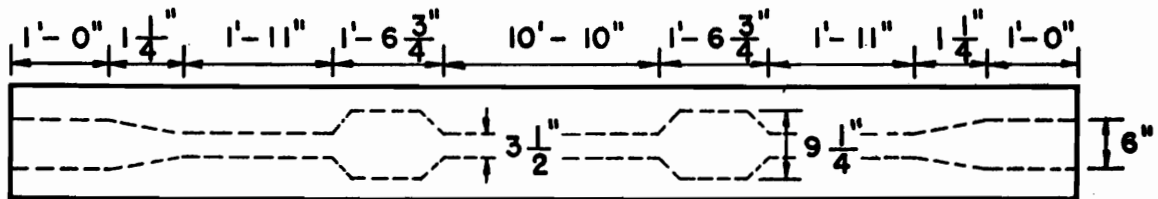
C PLAN VIEW OF B3A, B3B, B3C, AND B4A
